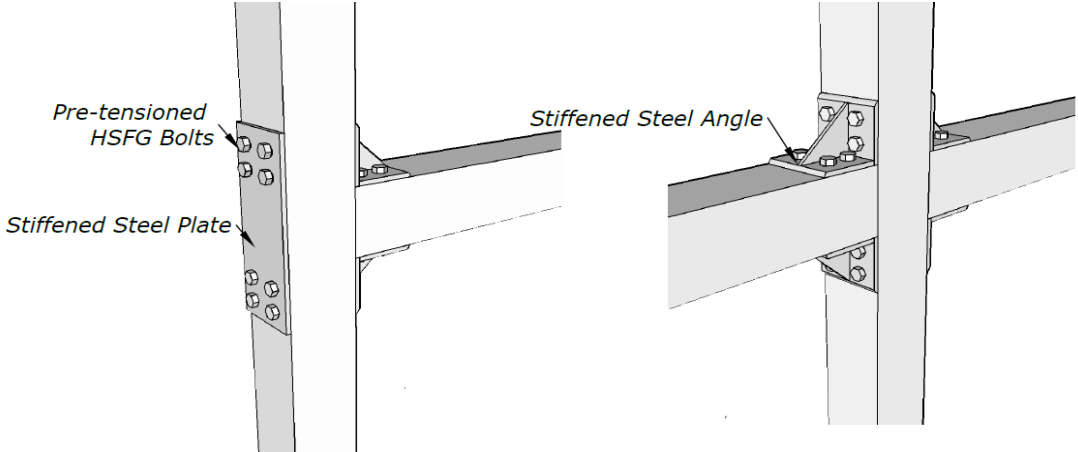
Beam-column connection system using steel angle, steel plate, and HSFG bolts
